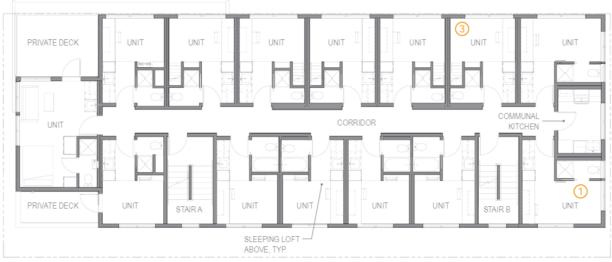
The Roost building. Upper level floor plan. Credit Neiman Taber Architects.
